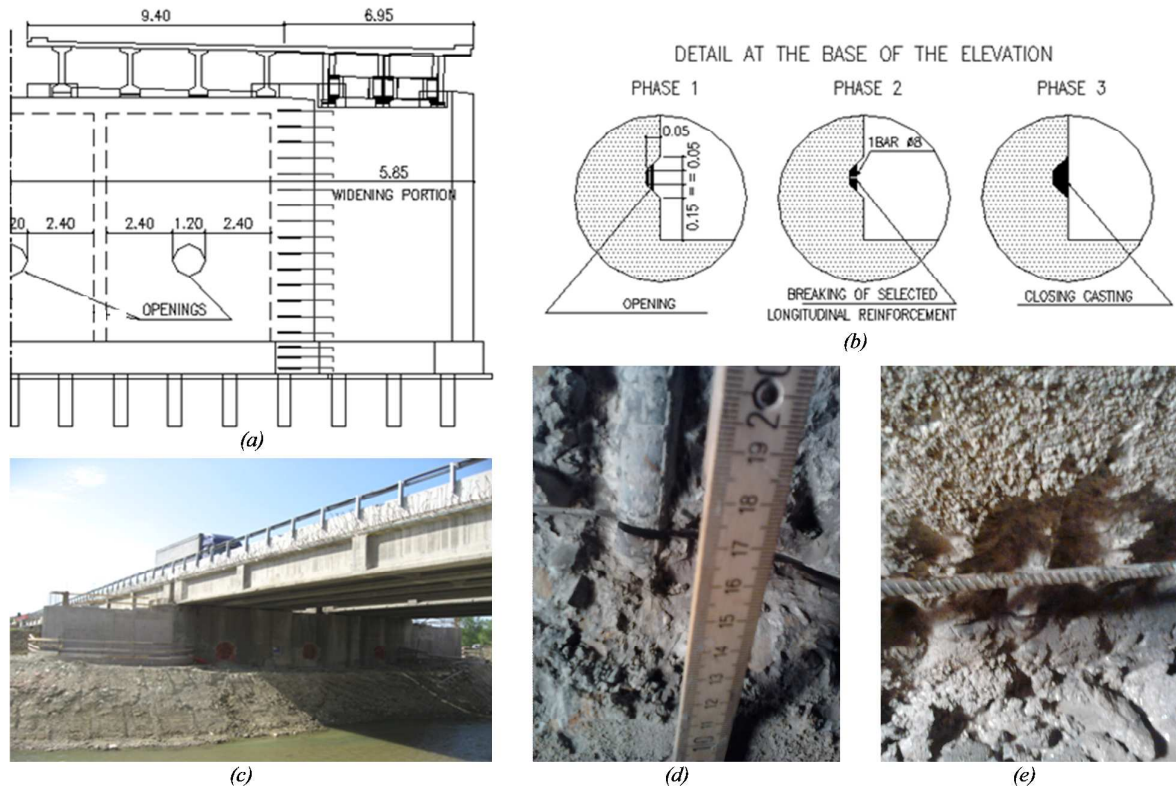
Widening and retrofitting interventions of the piers. (a) Original design solution for bridge widening. (b) Selective weakening intervention at the base of the pier elevation. (c) Widening solution for piers. (d)-(e) Cutting of a selected number of existing steel bars.
